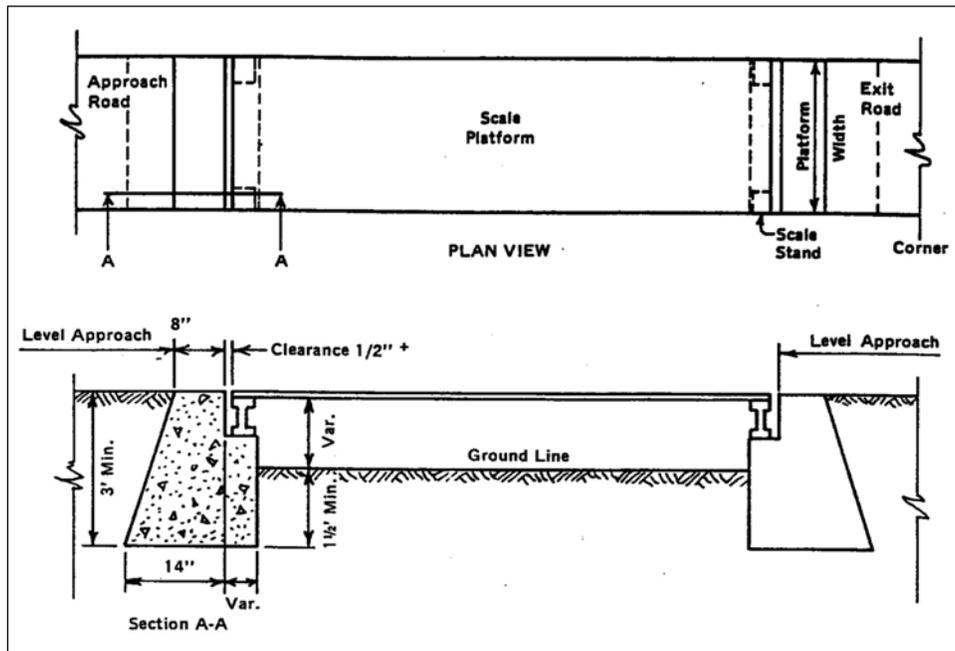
Truck Scale Installation Minimum Requirements, Full Width Bearing Type
